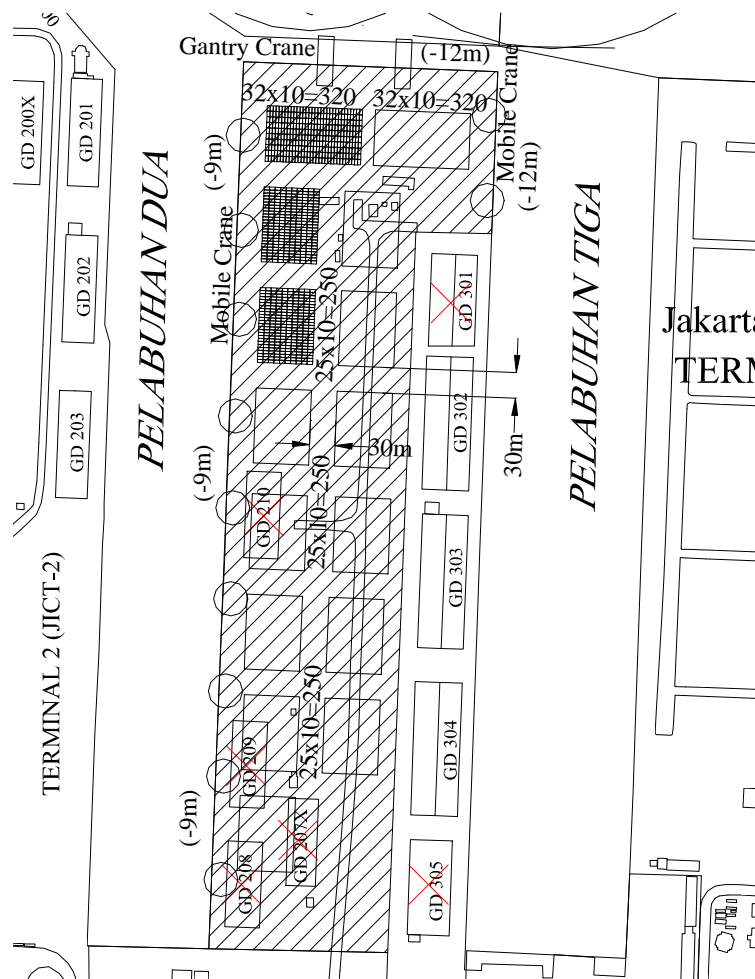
B-3 Layout of Inter-island Container Terminal in Pier-III
